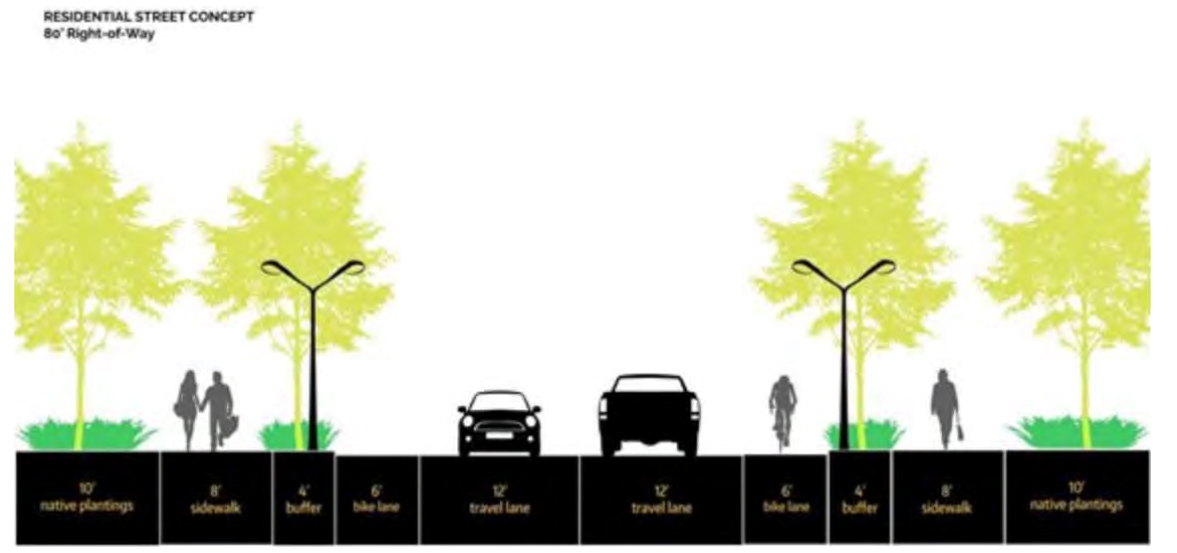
C.300-3. Residential Street Typology – 80-Foot Right-of-Way
